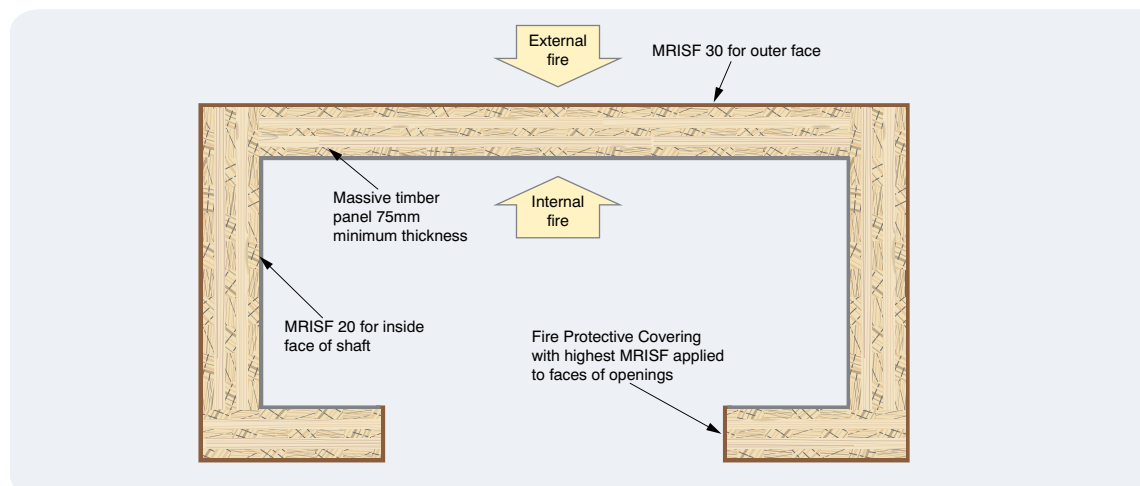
MRISF requirements for typical stair and lift shaft construction for single skin massive timber panel construction.
